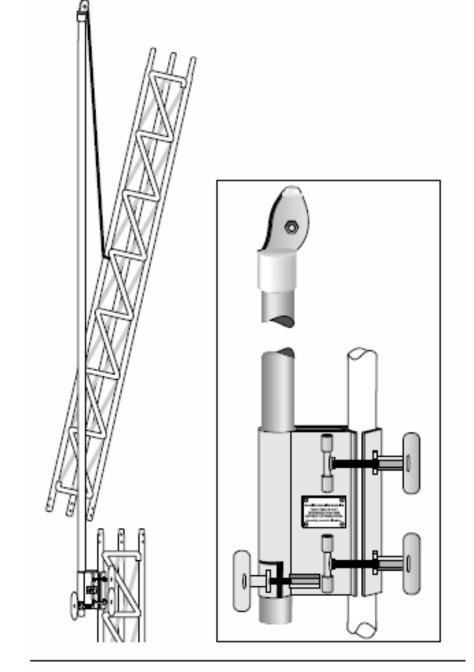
Drawing of Rohn "Erection Fixture" EF2545, also known commonly as a "gin pole."
